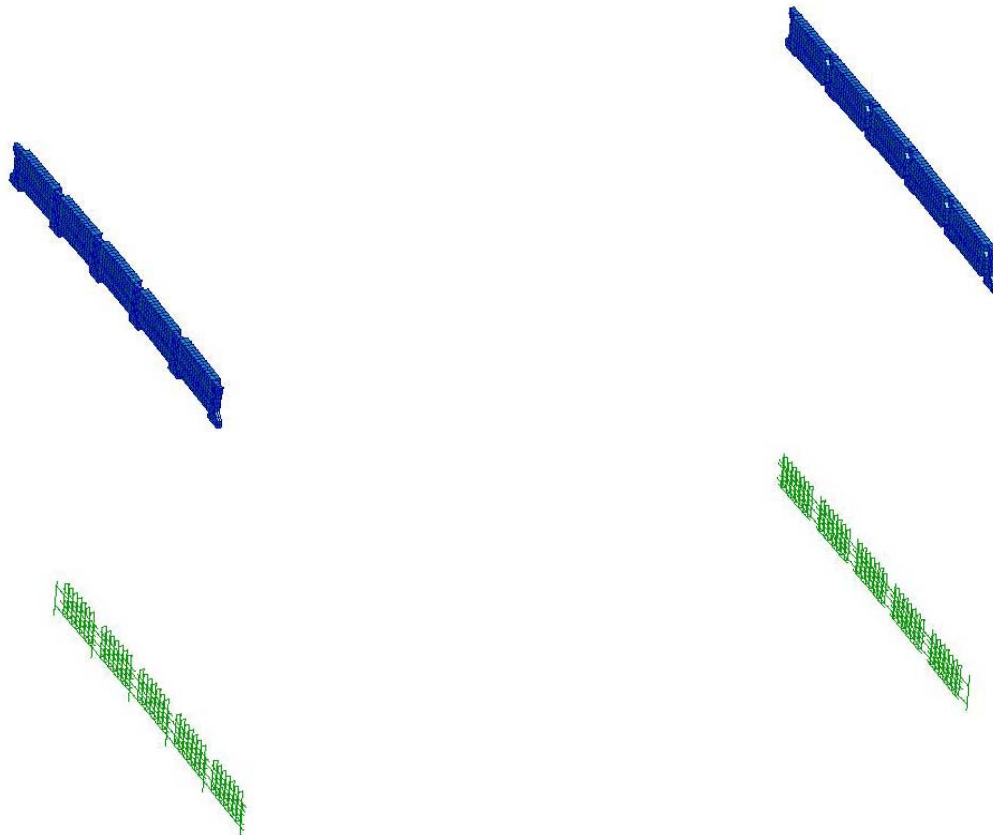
FE model of diaphragms, concrete and reinforcement.
